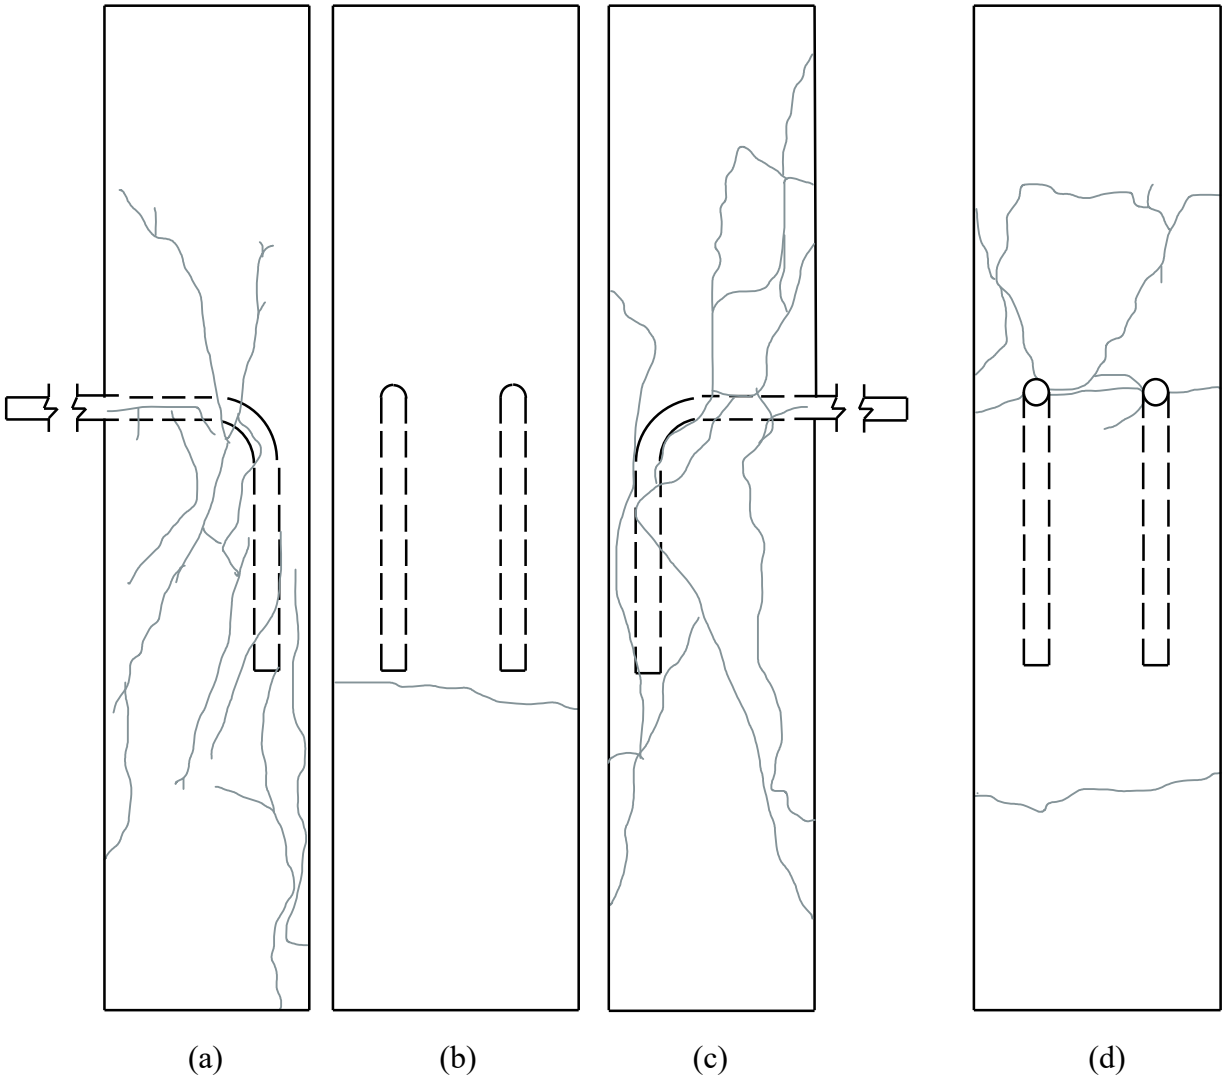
Crack pattern at maximum normalized tensile load for beam-column joint specimen P6-90: (a) west side face, (b) back face, (c) east side face, and (d) front face
